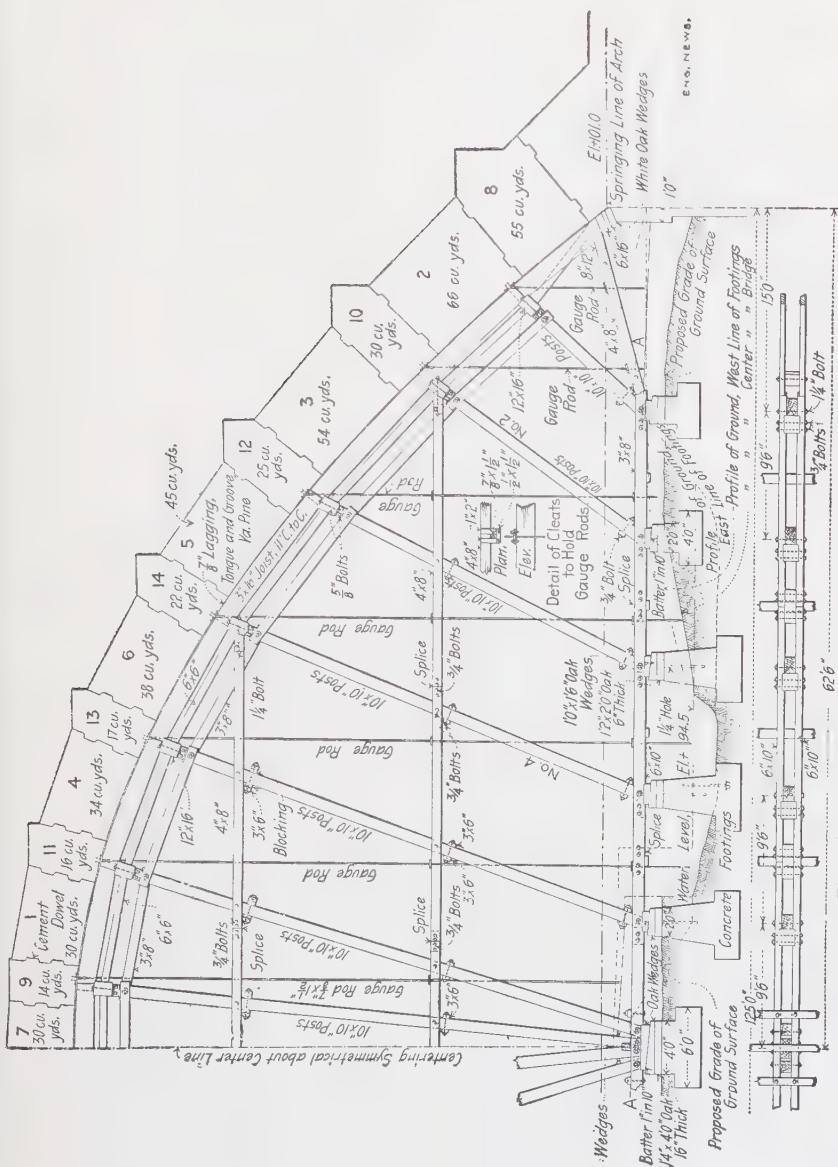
Centers for Piney Branch Concrete Arch Bridge on 16th Street, Washington, D. C.
